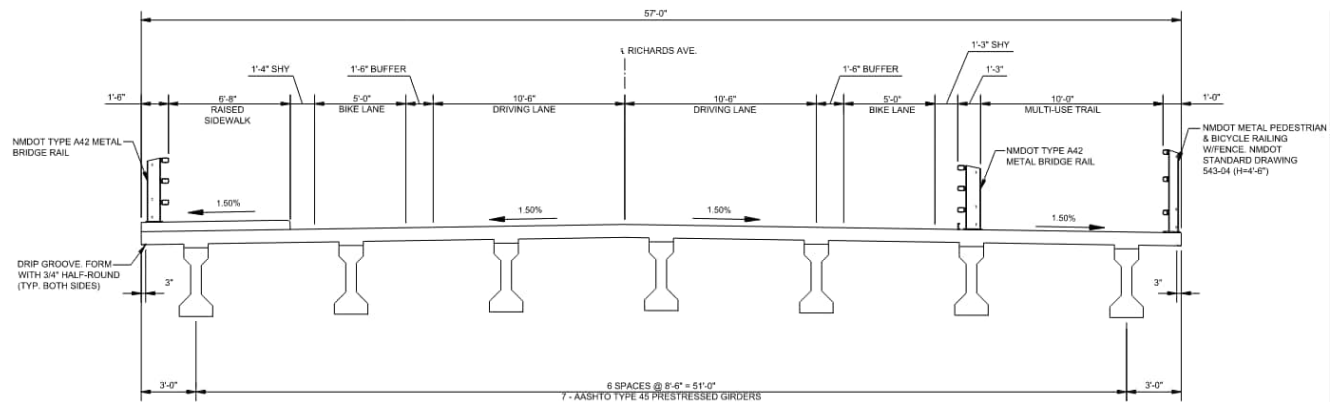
Proposed Two-Span Type 45 Prestressed Concrete Girder Typical Section
